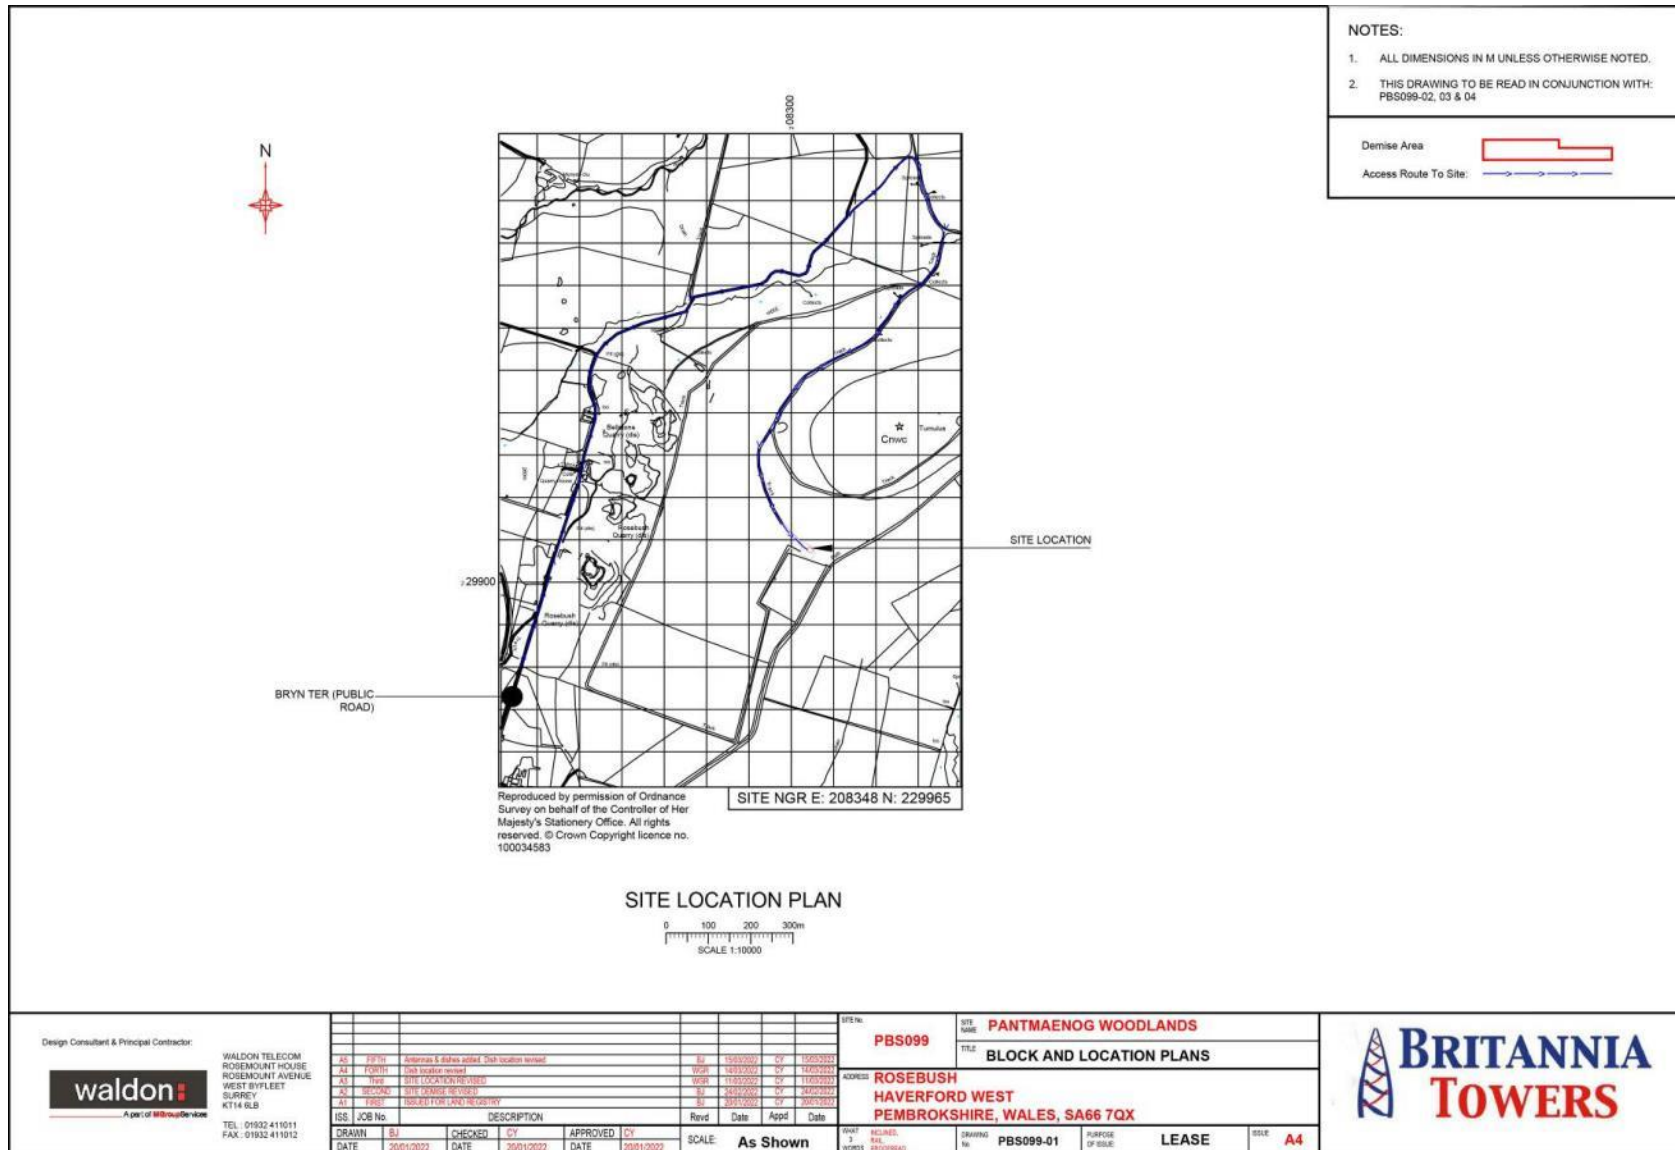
Detailed site location plan, as provided by the client. Not reproduced to scale.
